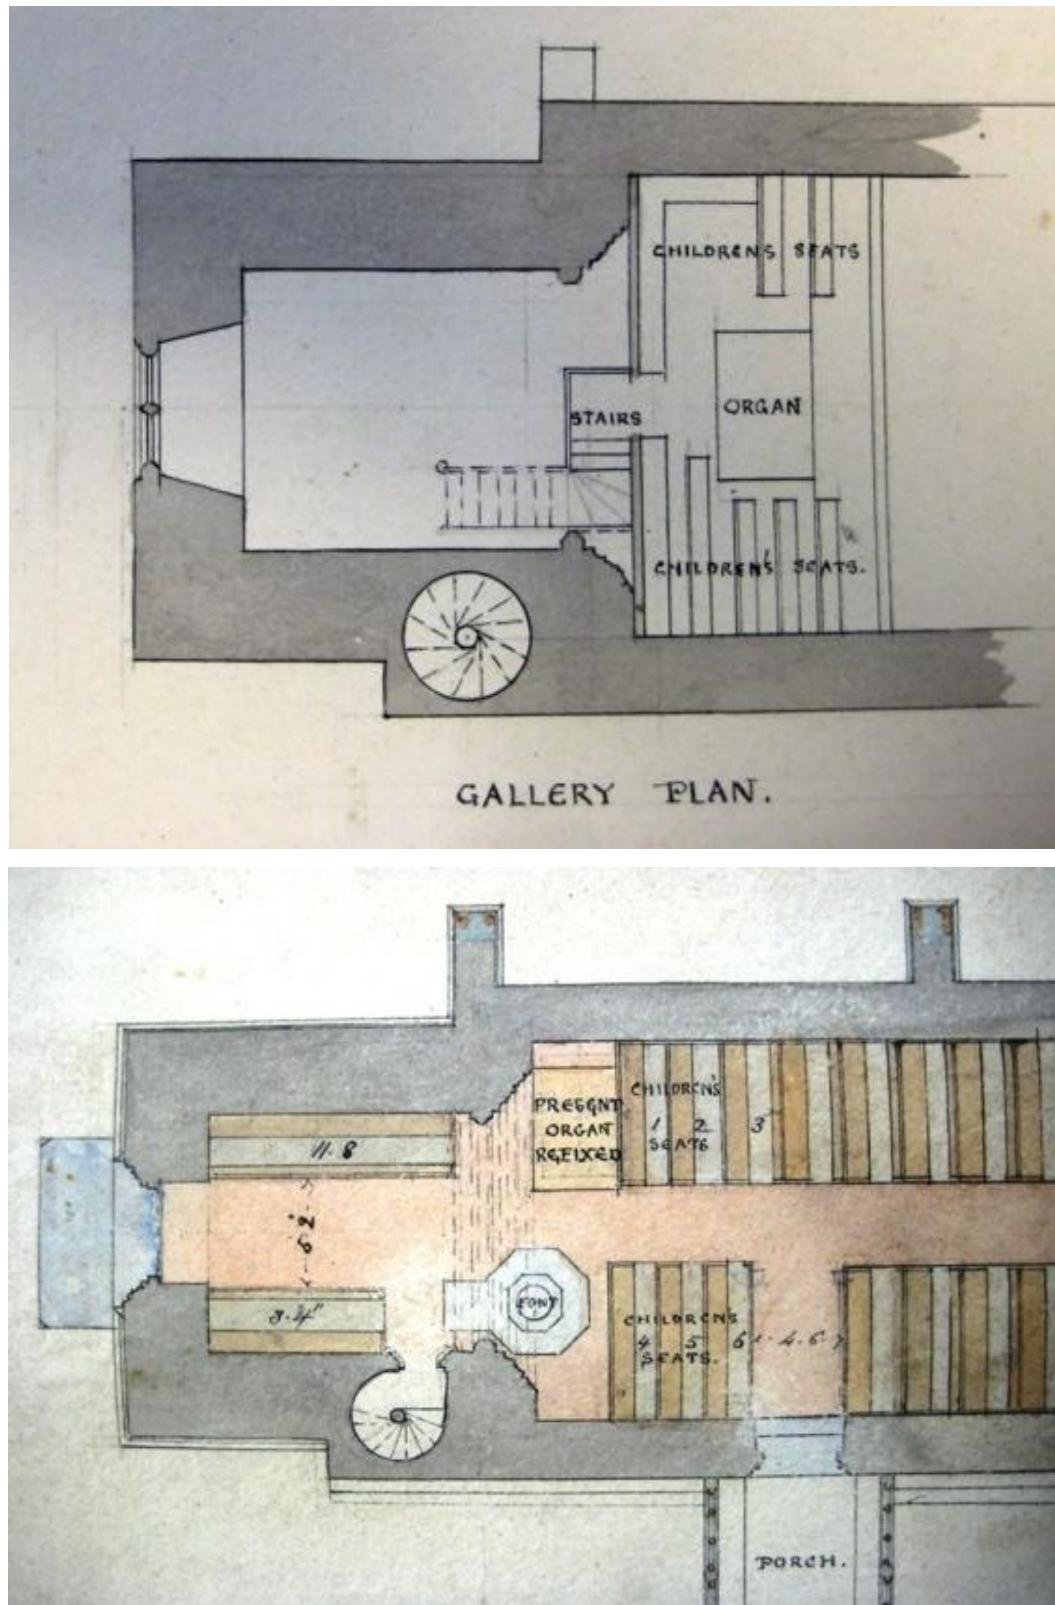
G.E. Pritchett, *Detailed plans of Widford Church* (1868).¹¹⁸⁷
